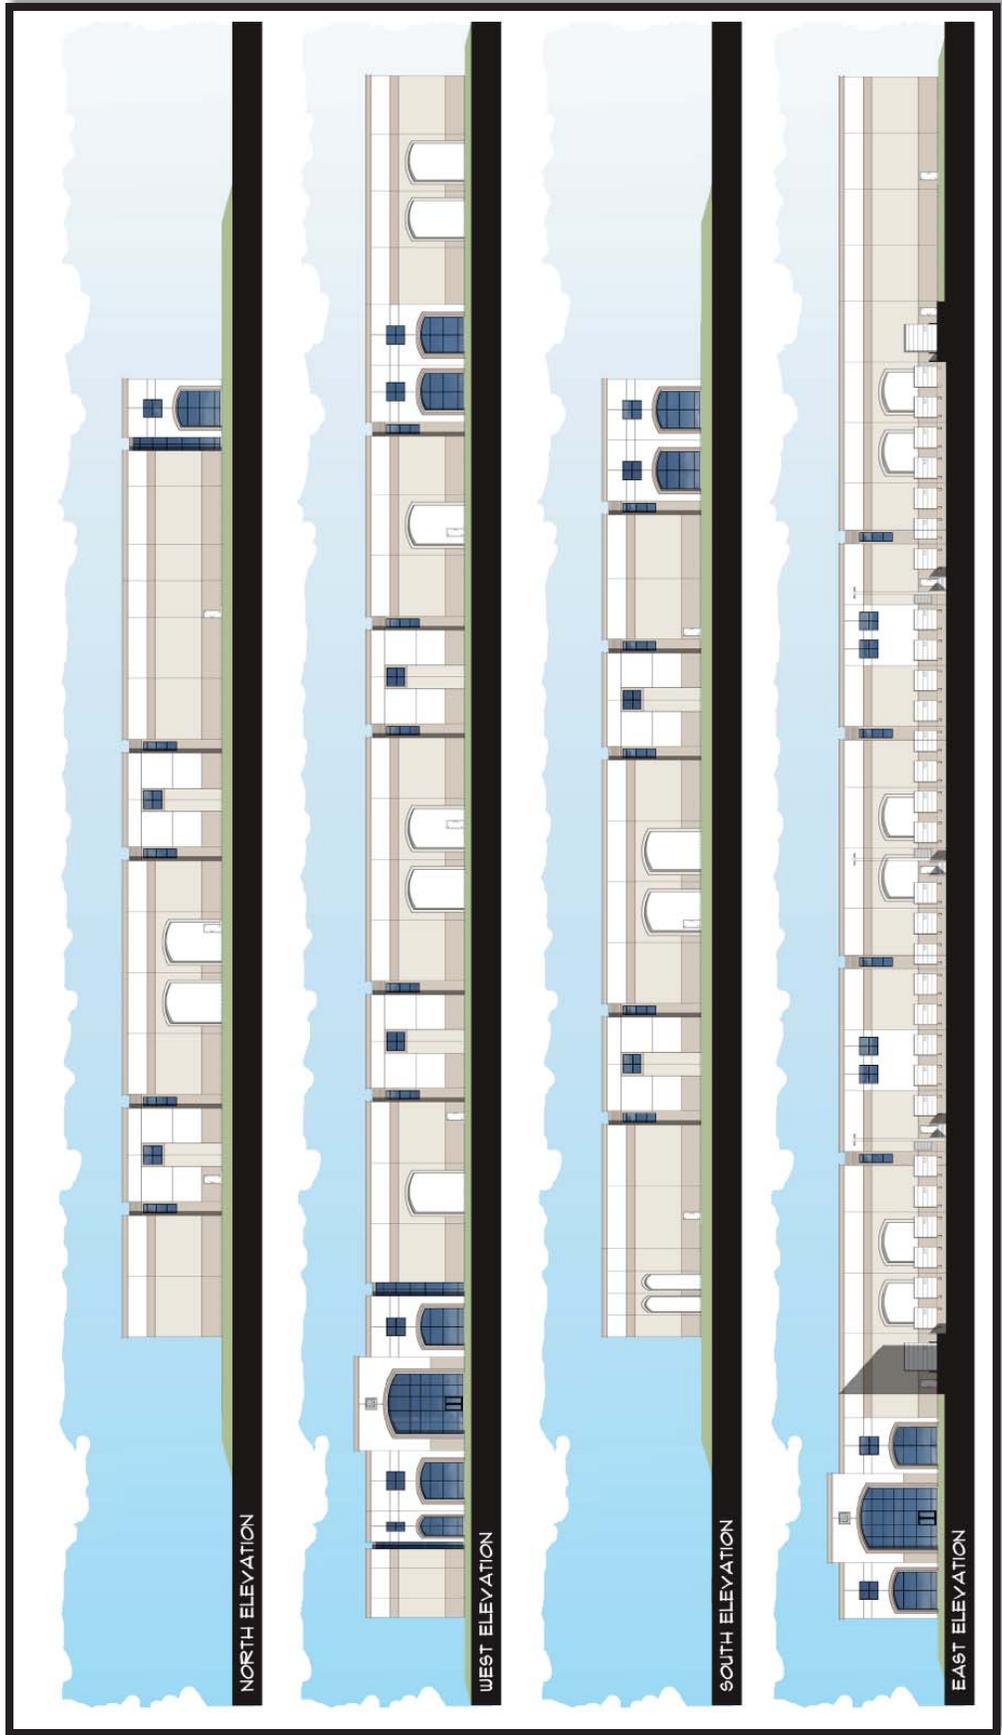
CONCEPTUAL BUILDING FORM
